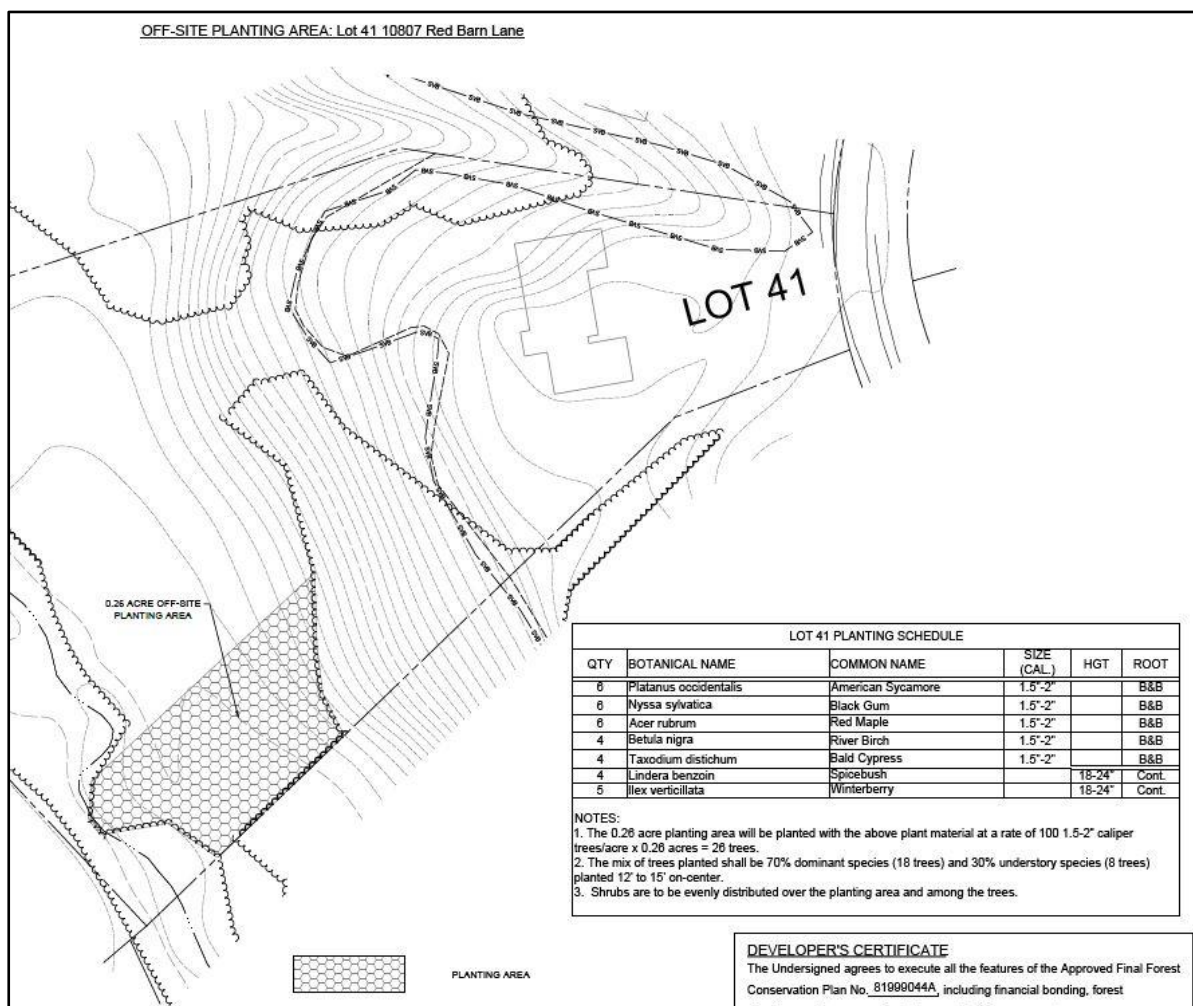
Horizon Hill Lot 41, 0.26-acre offsite mitigation planting
